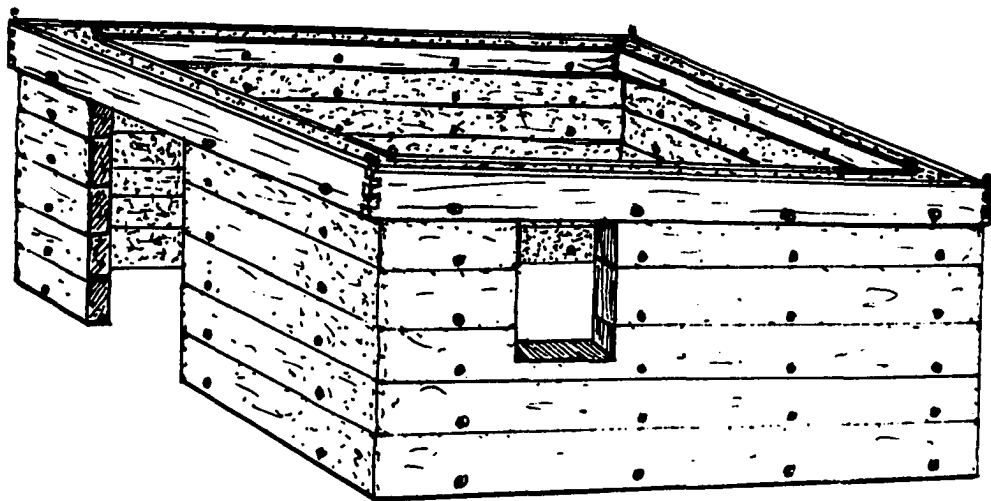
Sketch of Tabby Building in the Final Stage of Construction
